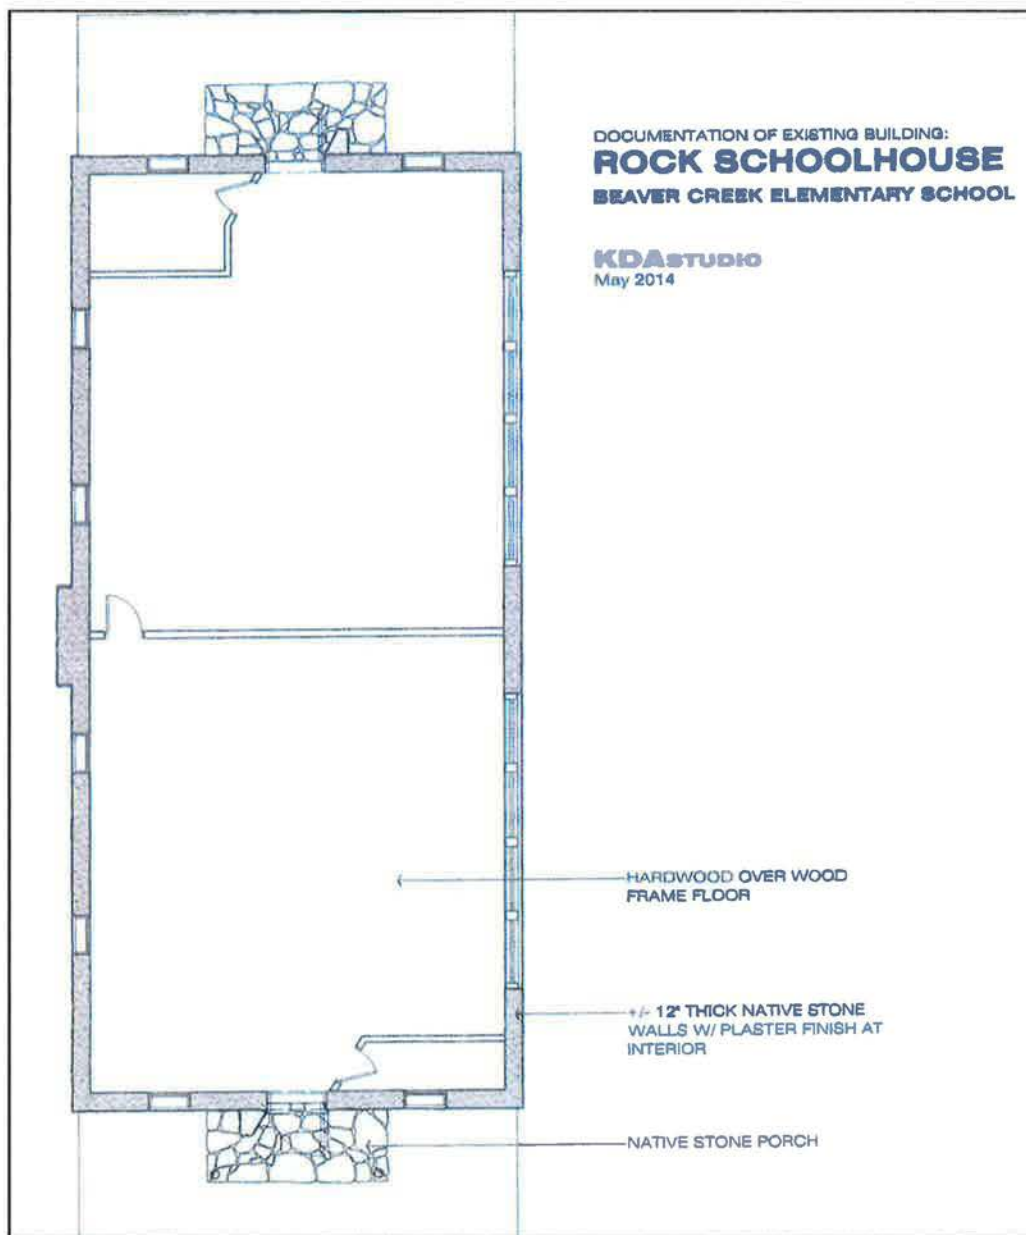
Floor plan of Rock Schoolhouse at Beaver Creek School. From *Documentation of Existing Building: Rock Schoolhouse, Beaver Creek Elementary School*, KDAstudio, 2014.
